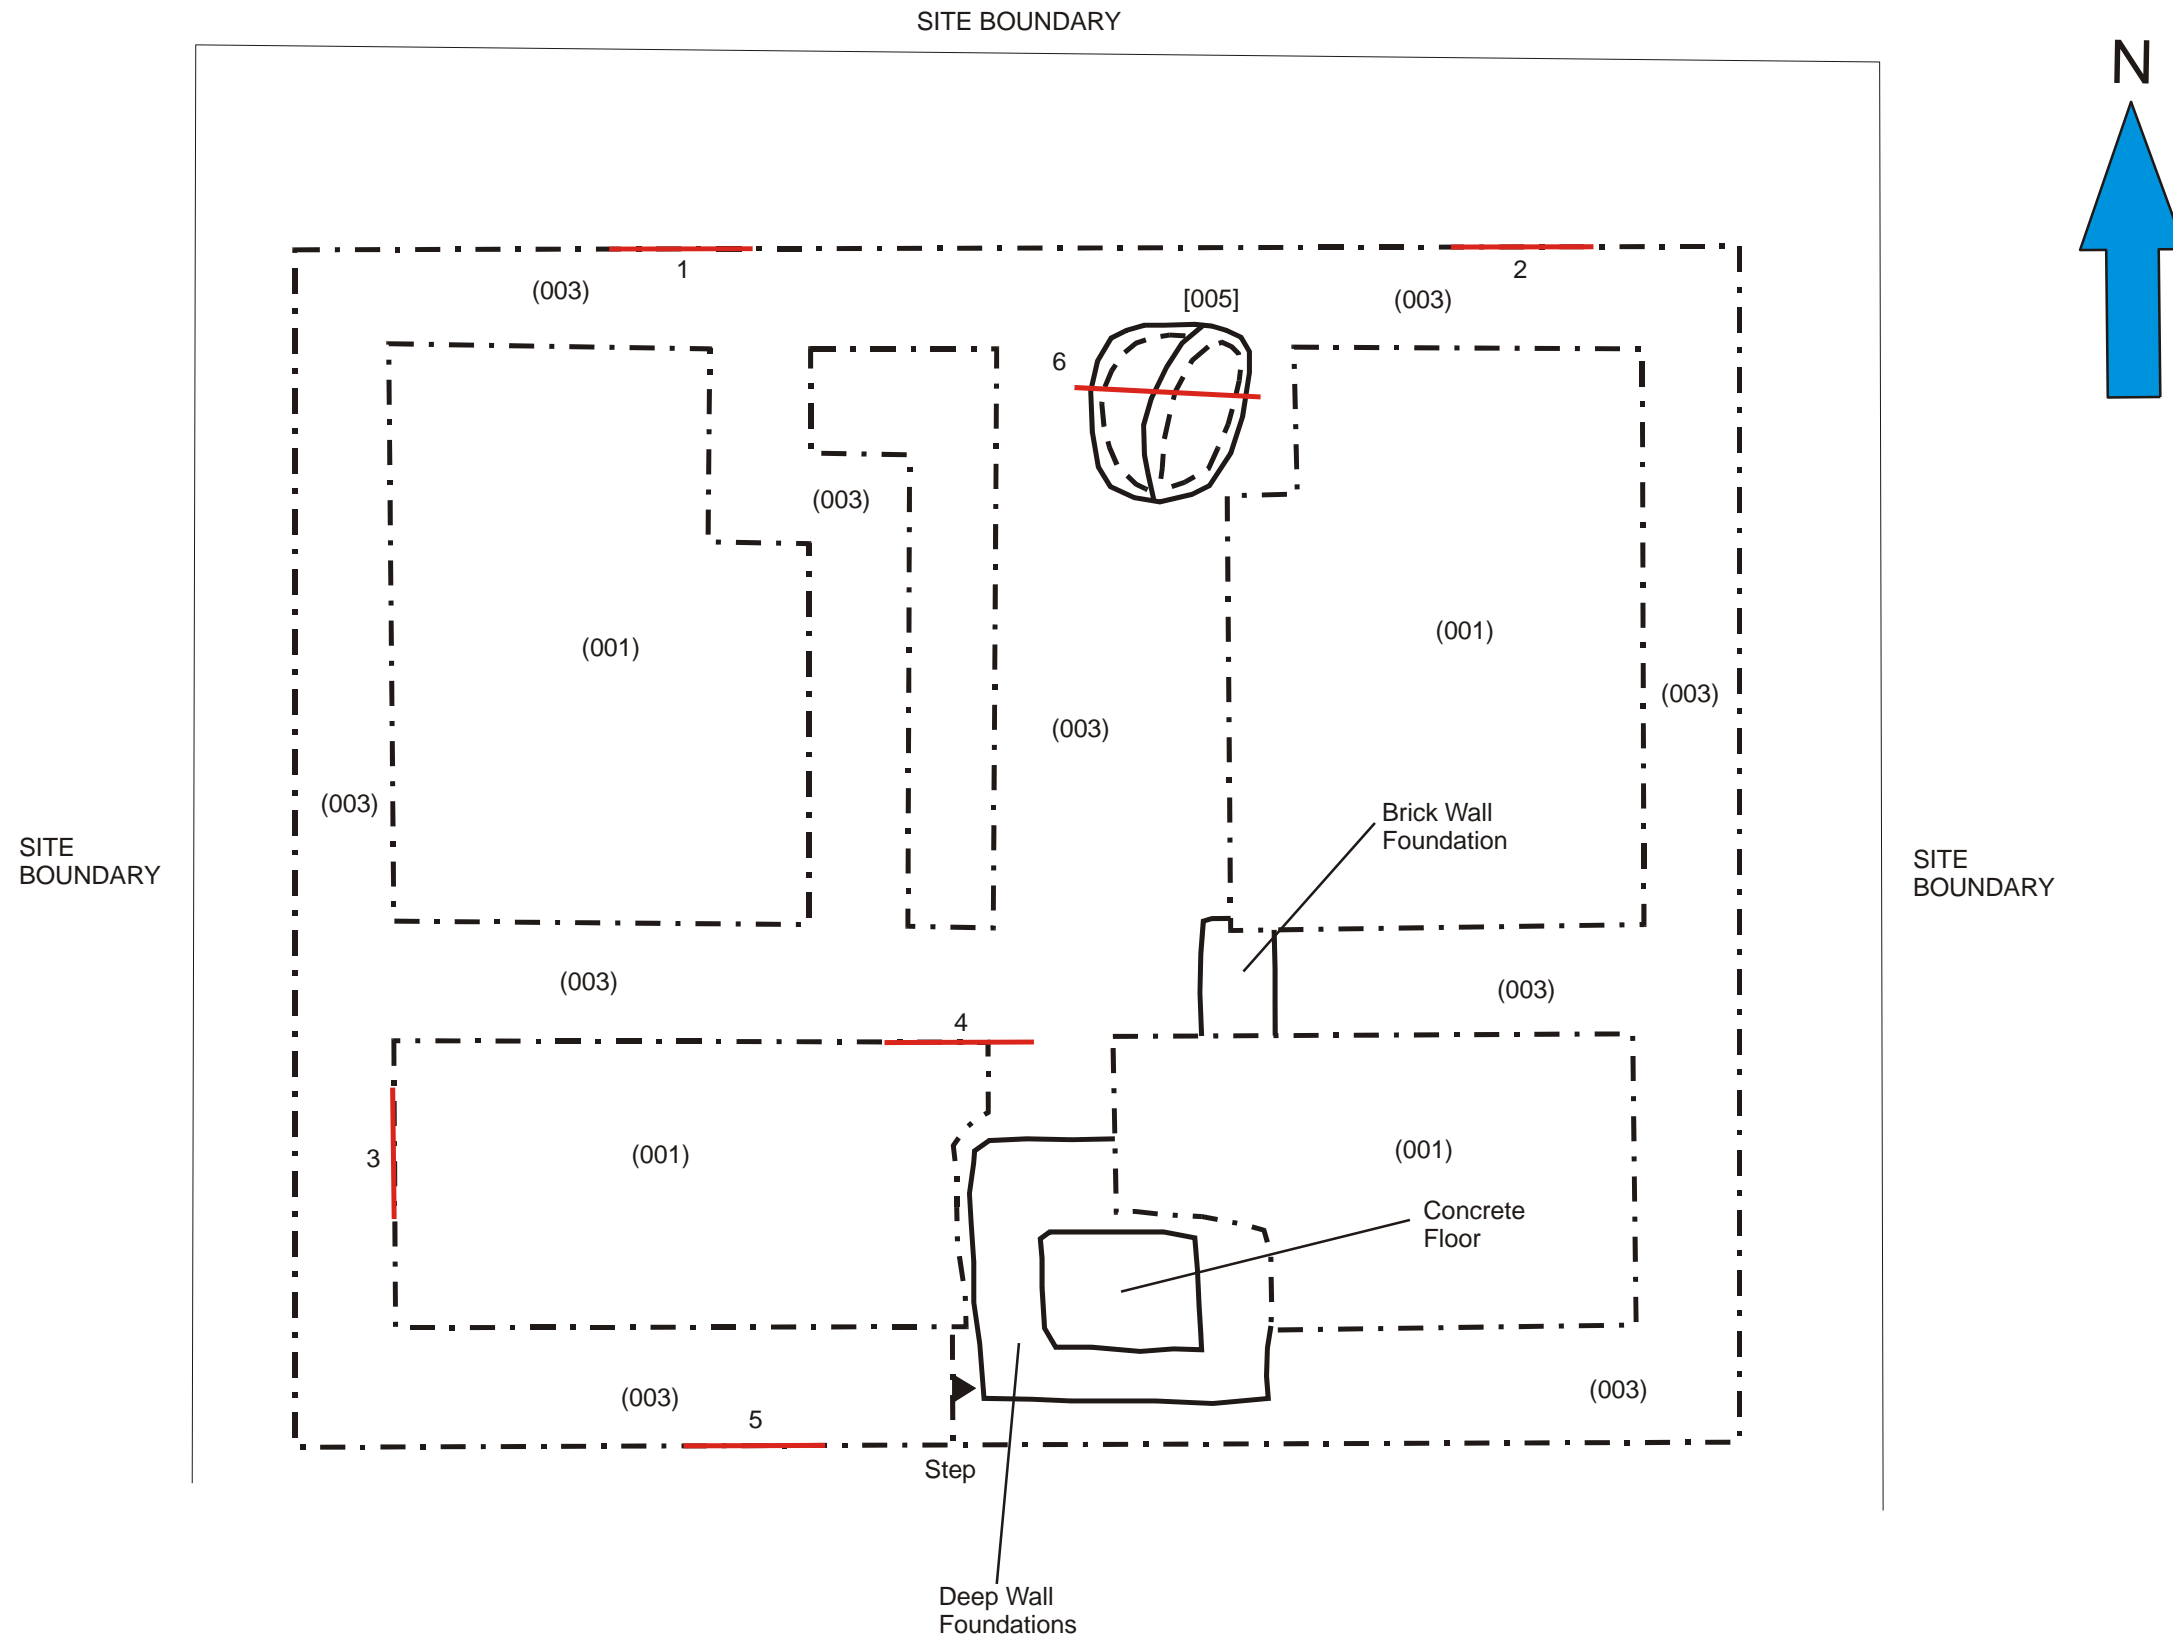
Plan of the Monitored House Foundations at a scale of 1:100
